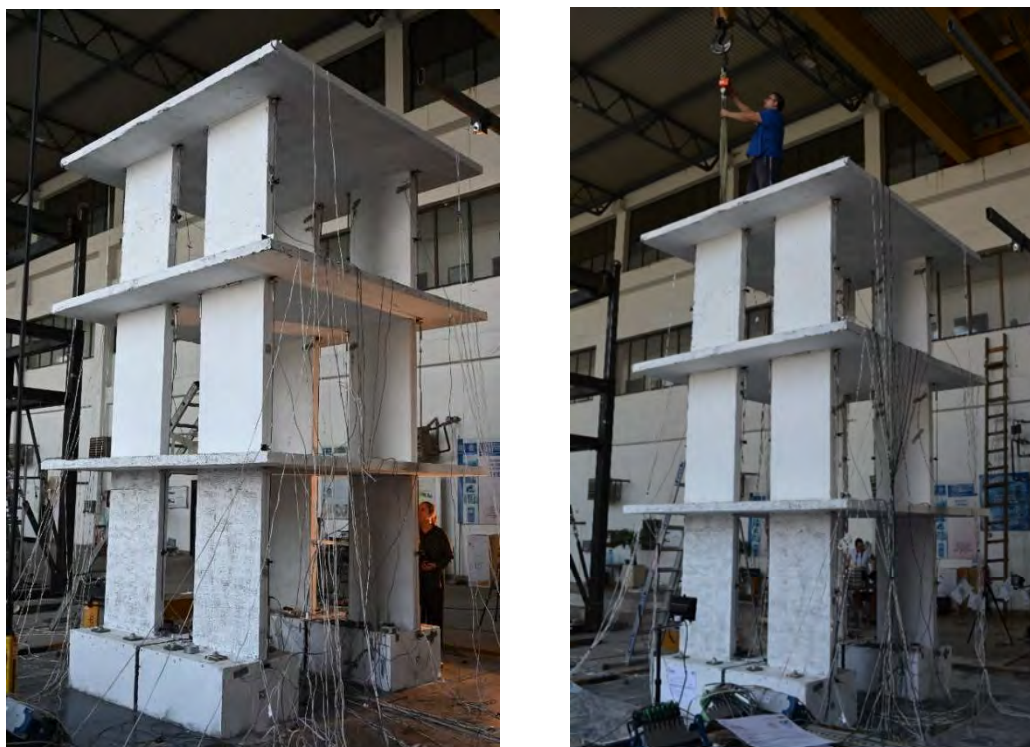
Laboratory specimen after construction (left) and mounted on the shaking table (right)
